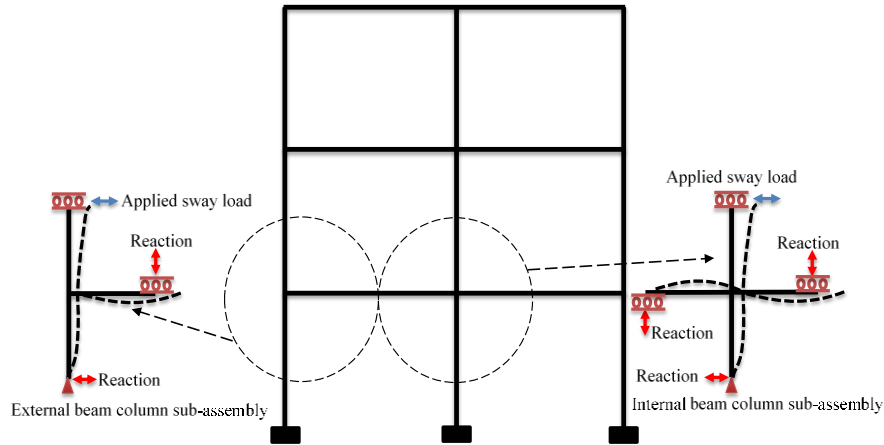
Location details of the beam column sub-assemblies of a perimeter frame
